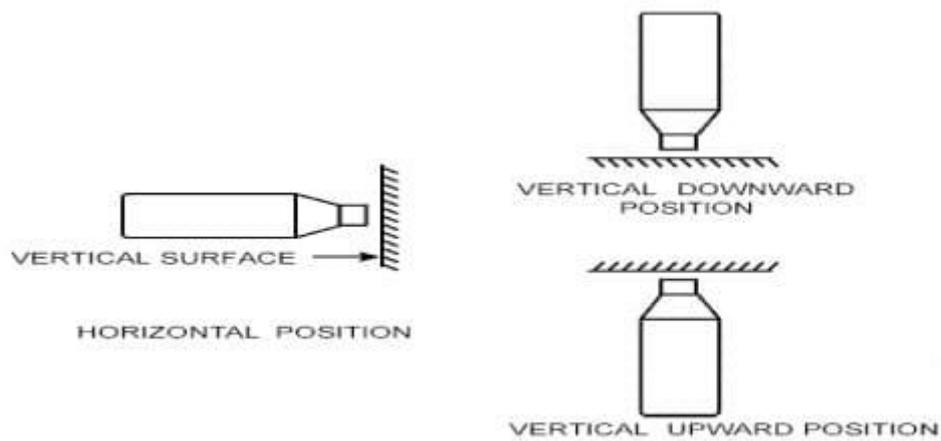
Rebound Hammer Positions for Testing Concrete Structure
